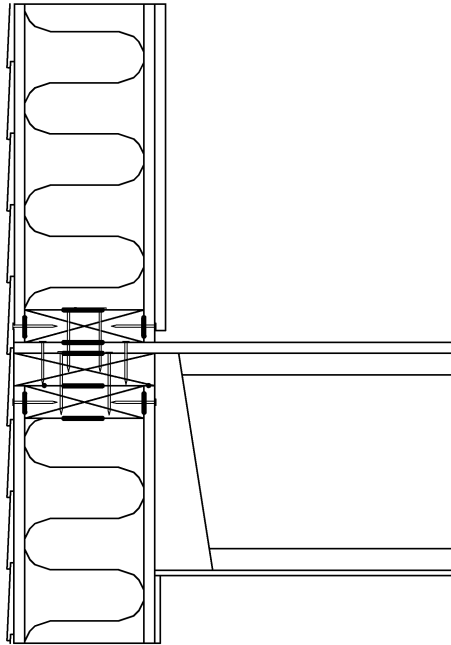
Connection where a top flange metal floor joist hanger is used to connect the floor to the exterior wall.
